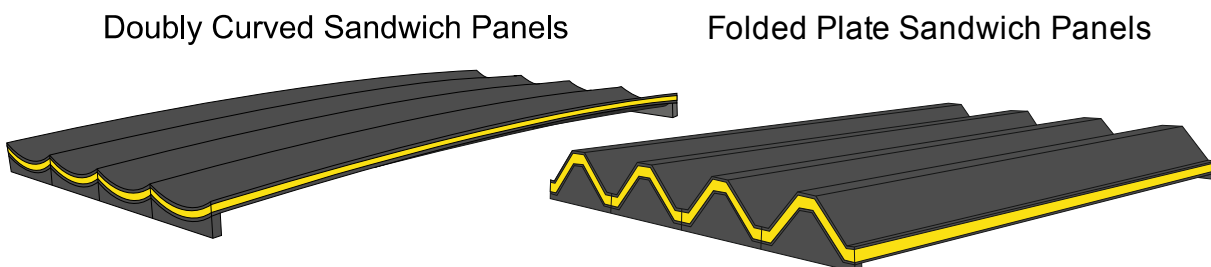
Doubly curved and folded plate sandwich panels for roof construction
